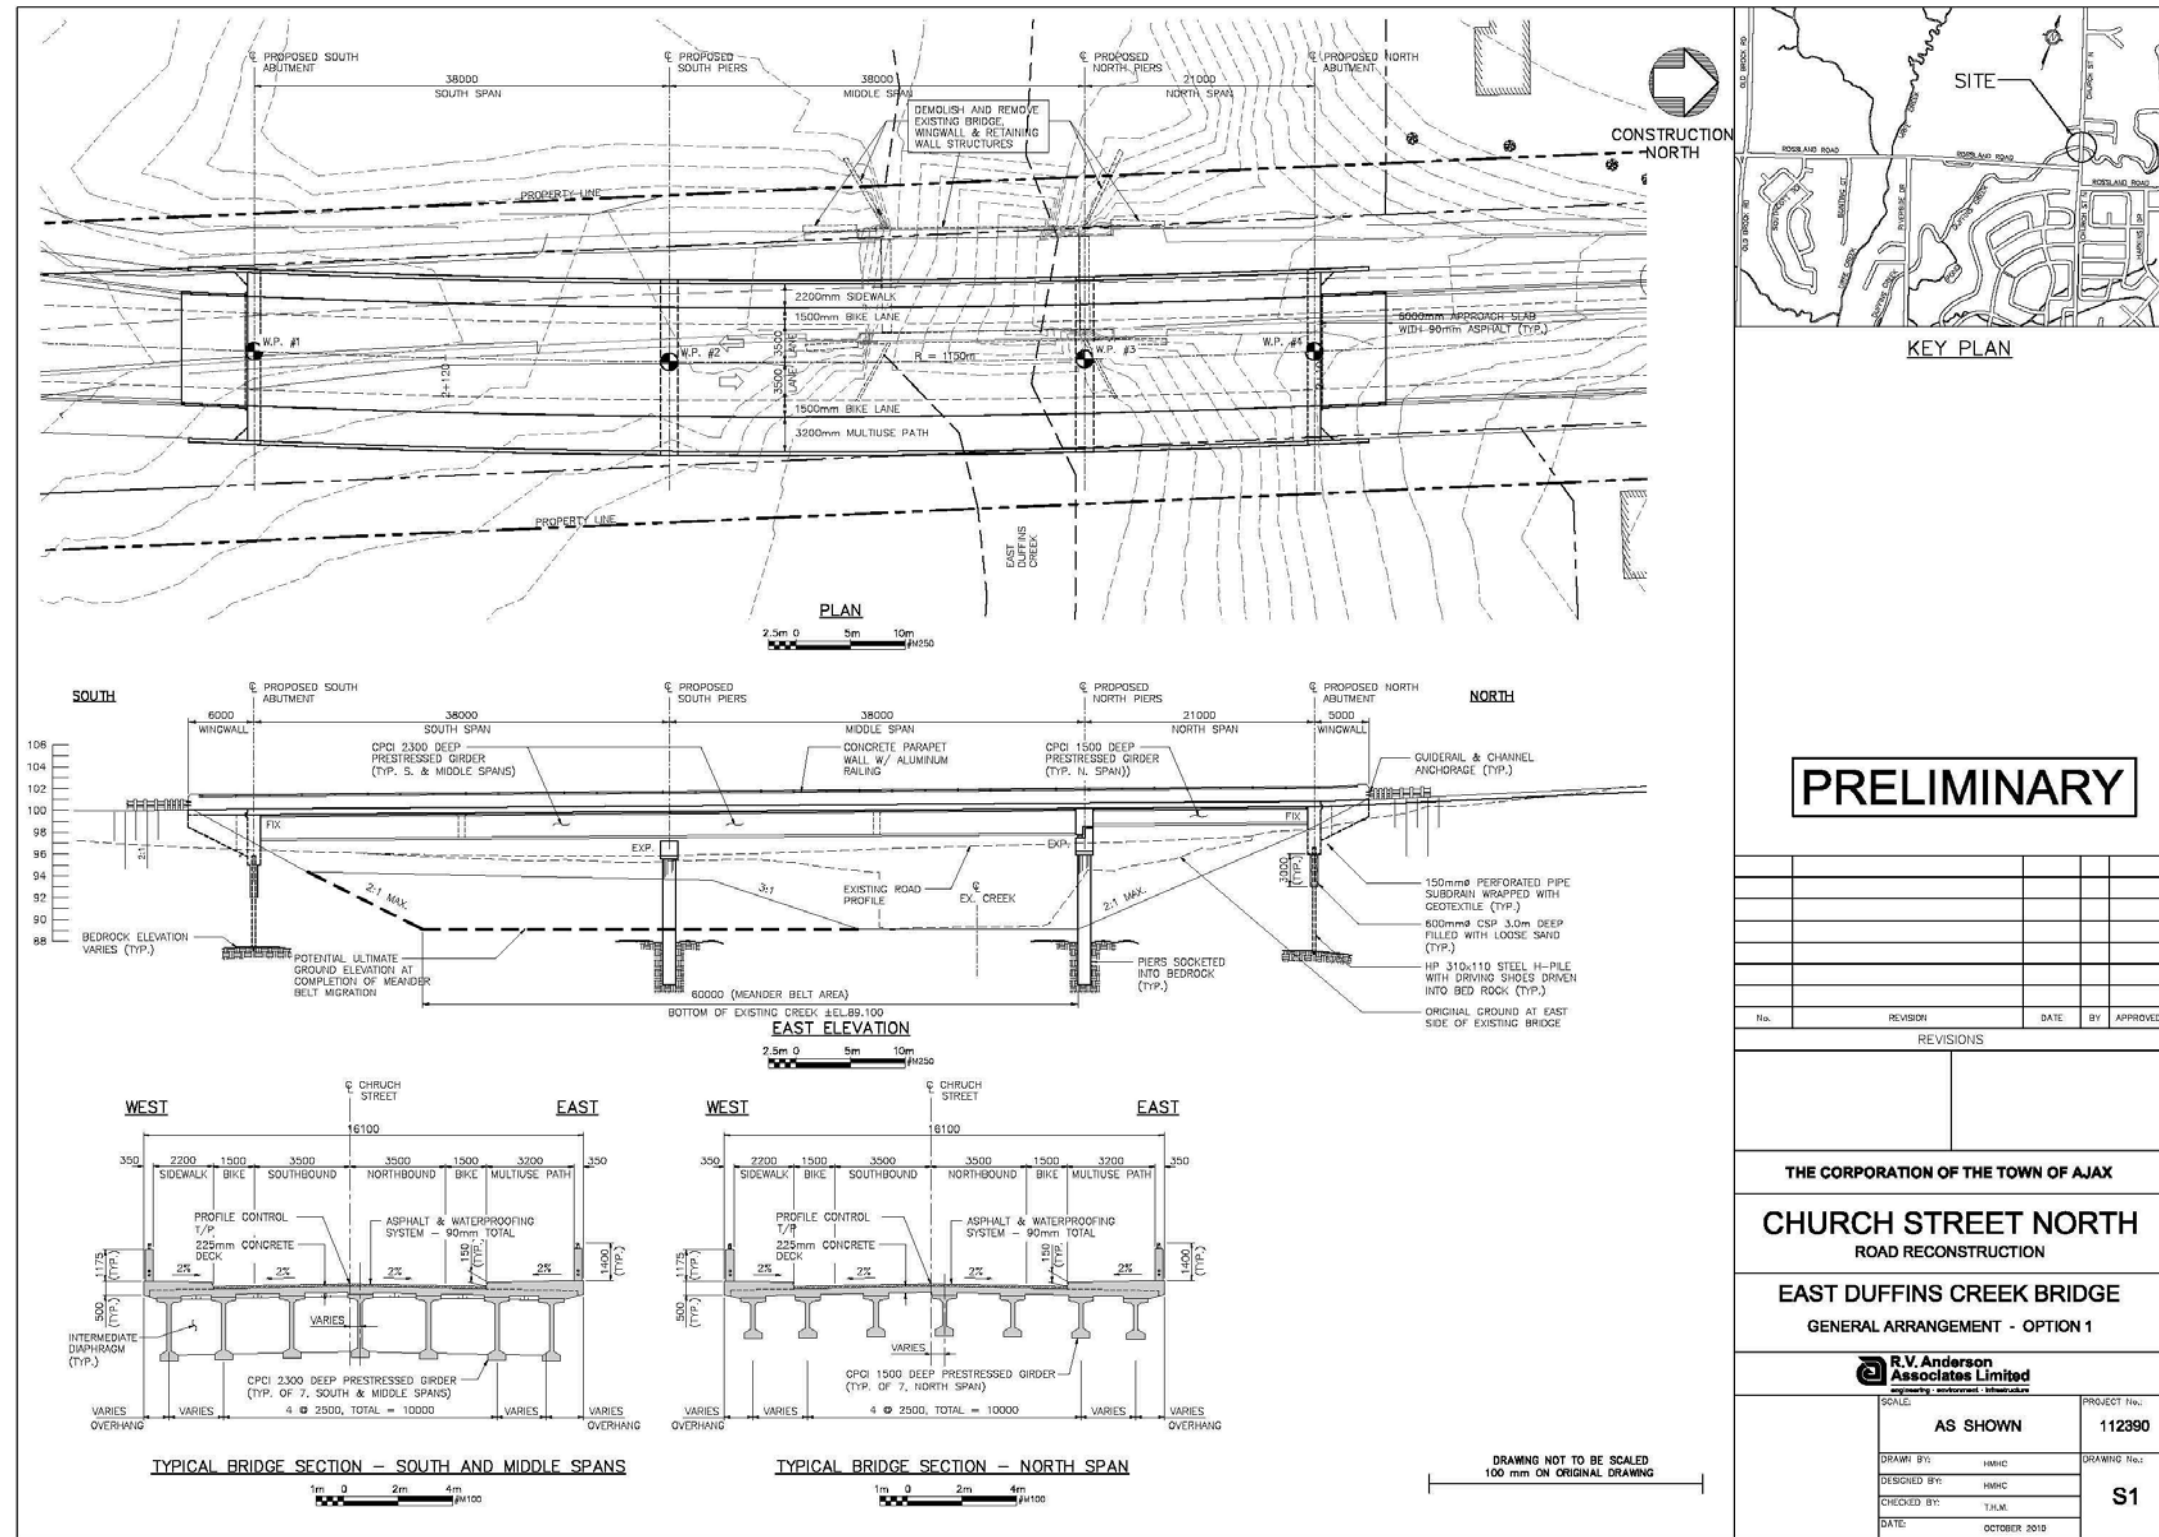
Preliminary General Arrangement Drawings – Three Span Bridge
